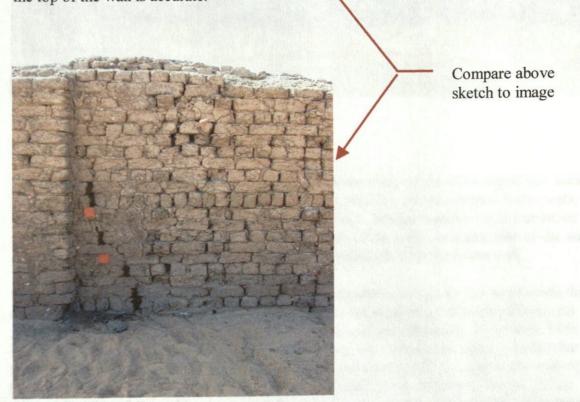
Detail of the east side of the east wall that is shown in the sketch elevation above.
